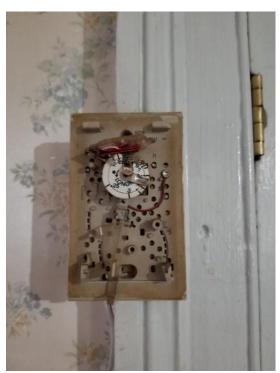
View of mercury-containing thermostat in the first floor kitchen.
